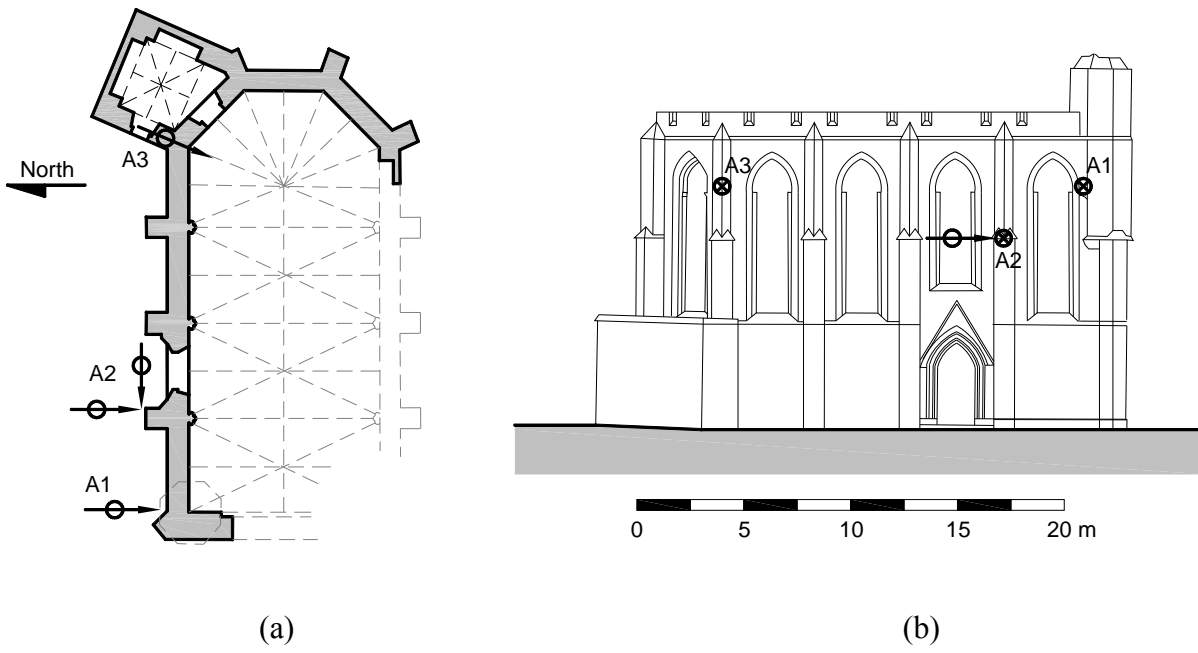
Test planning of St. George of the Latins church: (a) top plan; and (b) north façade.
